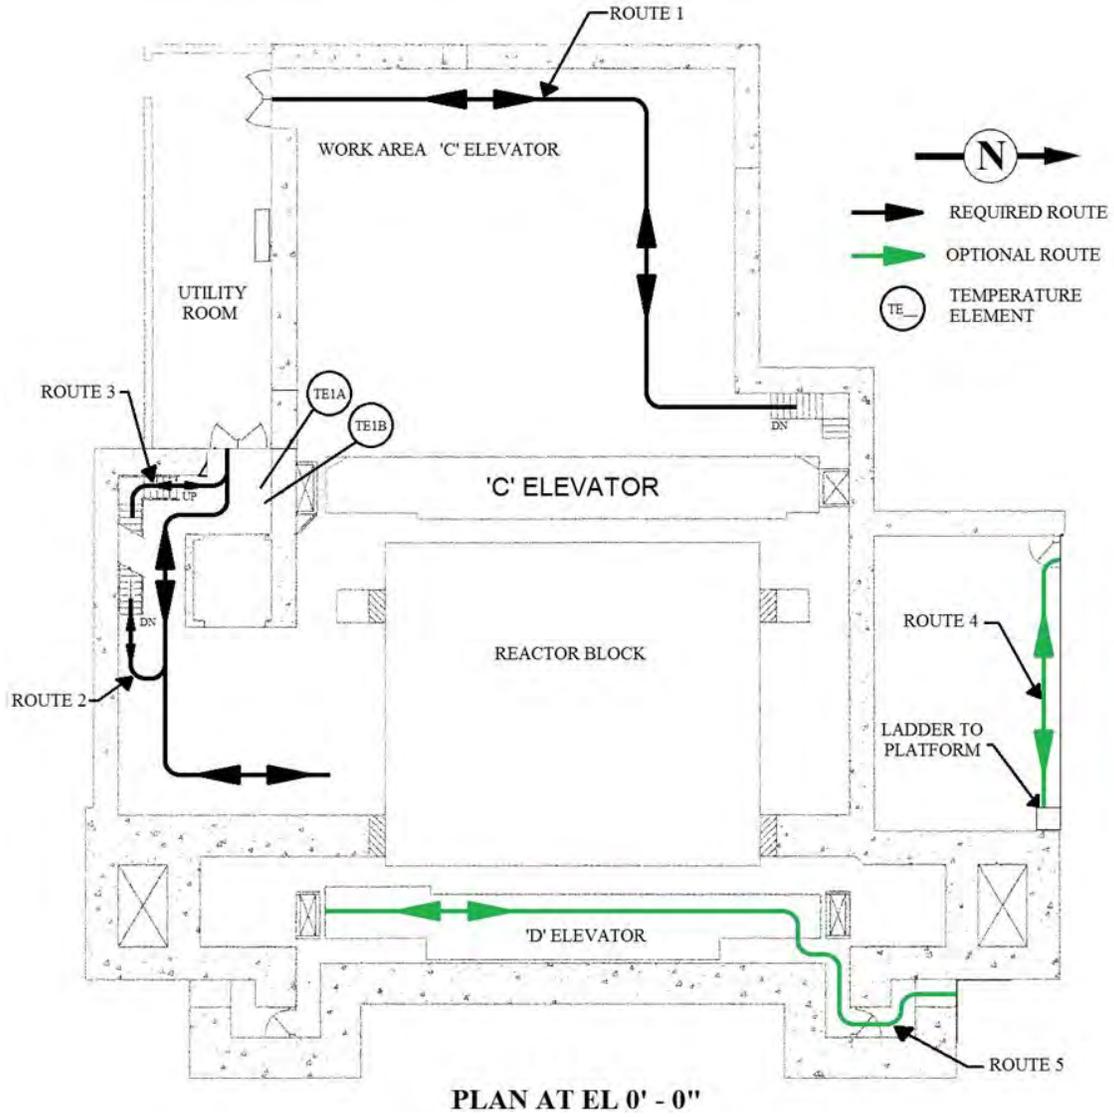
105-DR Safe Storage Enclosure Floor Plan Elevation 0 ft - 0 in.
